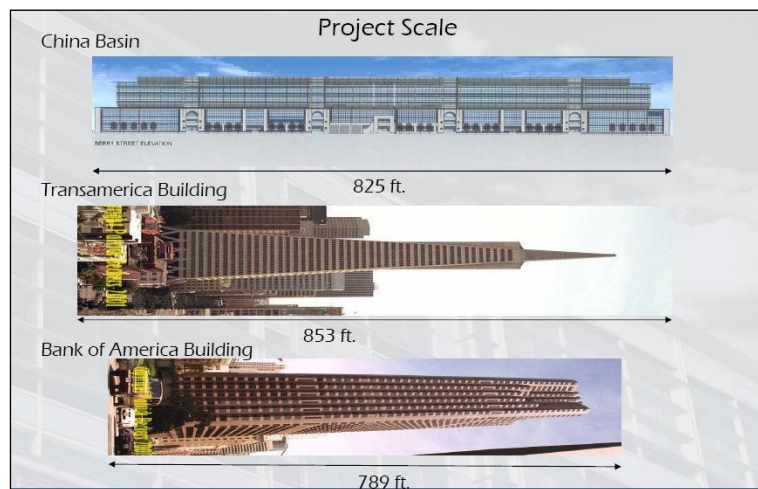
Project scale: (a) China Basin, (b) Transamerica Building, (c) Bank of America Building
